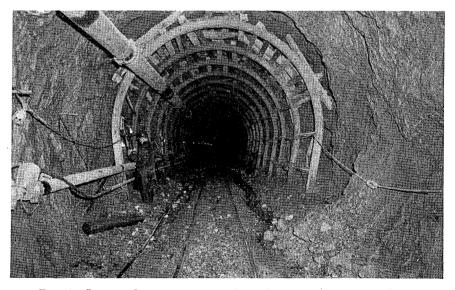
Looking Southerly Toward Long Section of Structural Steel, Northern end of Which Is at Station 33 + 17. Rock Is Tuff-Beccia of Lynn Volcanics
